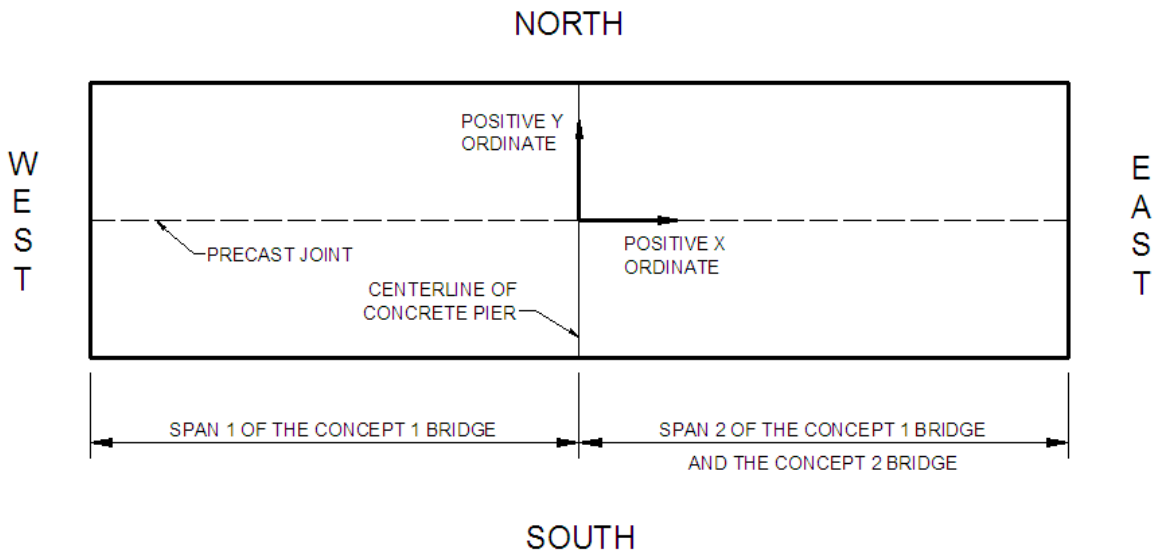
Location of origin and definition of positive x and y ordinates for instrumentation layout in the Concept 1 and Concept 2 laboratory bridge specimen
